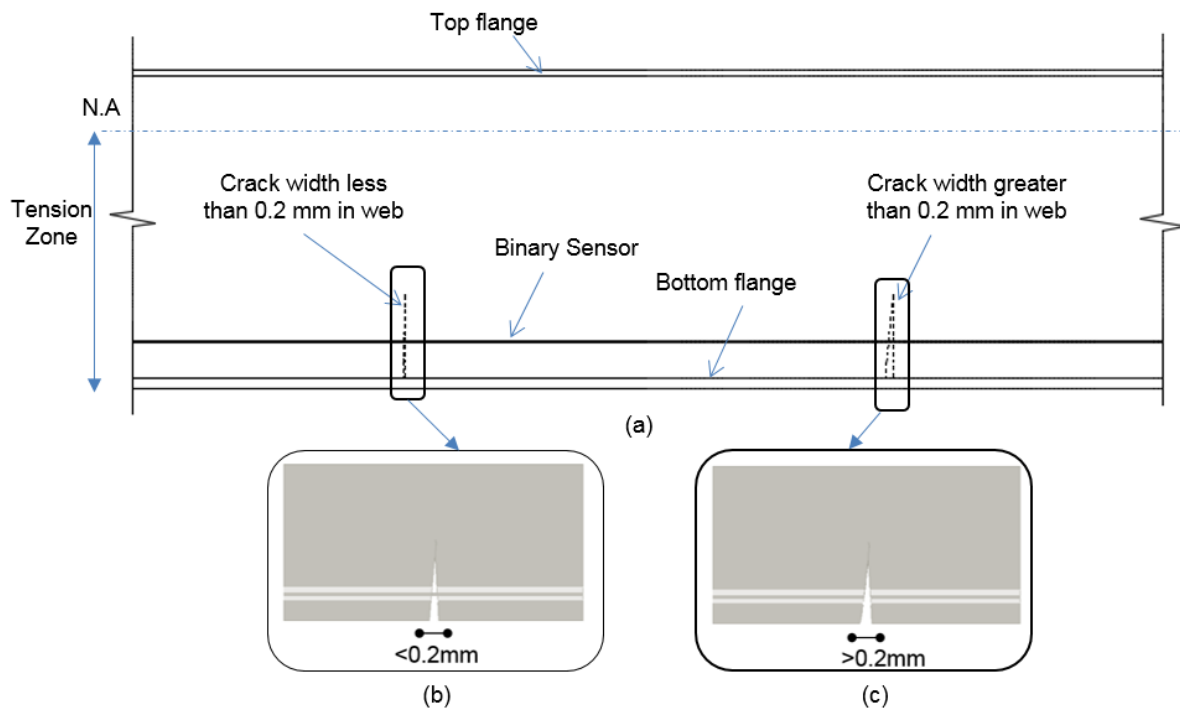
1. a) The Binary crack sensor will be installed on the entire length of a steel girder and is comprised of wire adhering to the steel girder using an adhesive. By formation of crack in steel girder, strains will be transferred to the epoxy b) crack propagates through the epoxy when crack opening on the girder is less than 0.2 mm but wire remains connected c) over time, under tensile stresses, crack opening increases and causes the wire to break which will result in a change in the resistance of wire [17]
